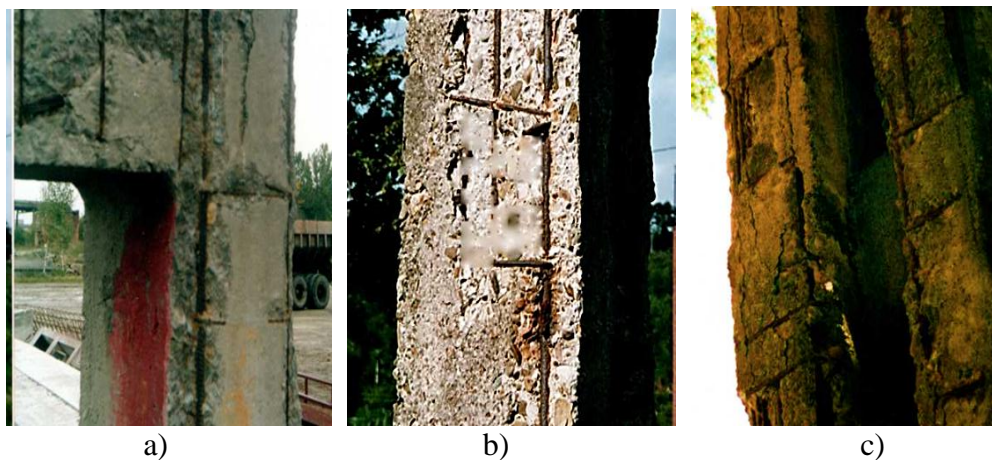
Destruction of reinforced concrete structures of the plant "Three Concretes" in Stryi (the Lviv region): a – the destruction of columns and walls with a crossbar; b – the destruction of concrete columns and significant corrosion of reinforcement; c – the concrete destruction of paired columns and significant corrosion of reinforcement in them
